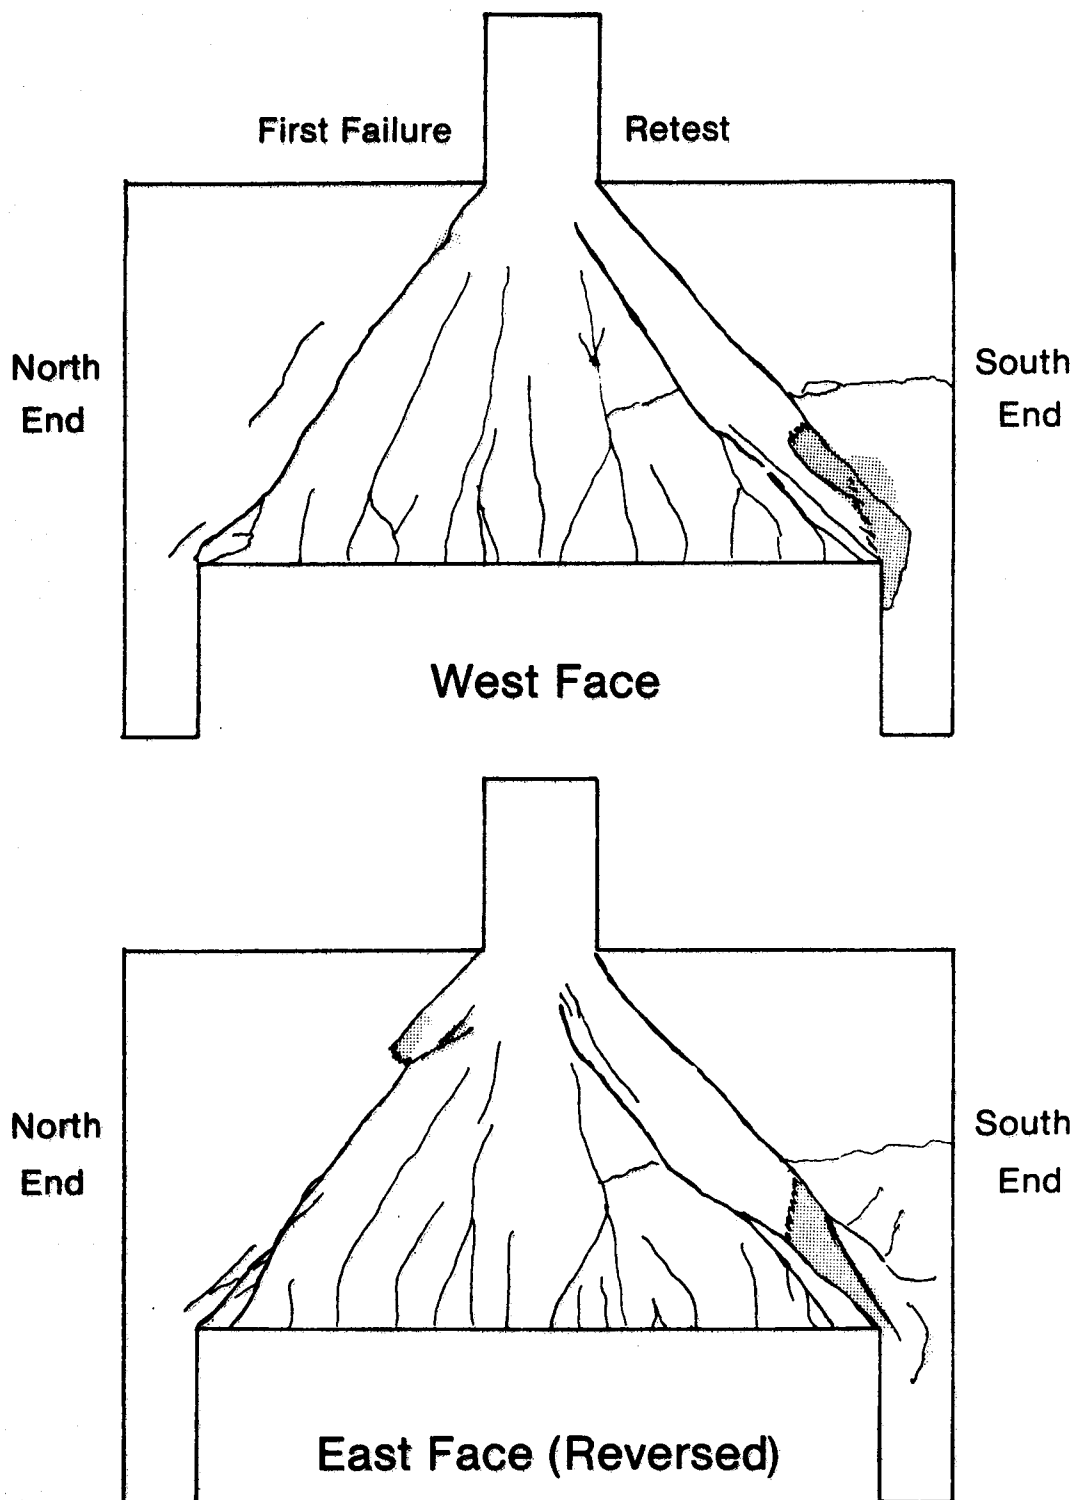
(a) Beam 1/1.0 Crack Patterns
